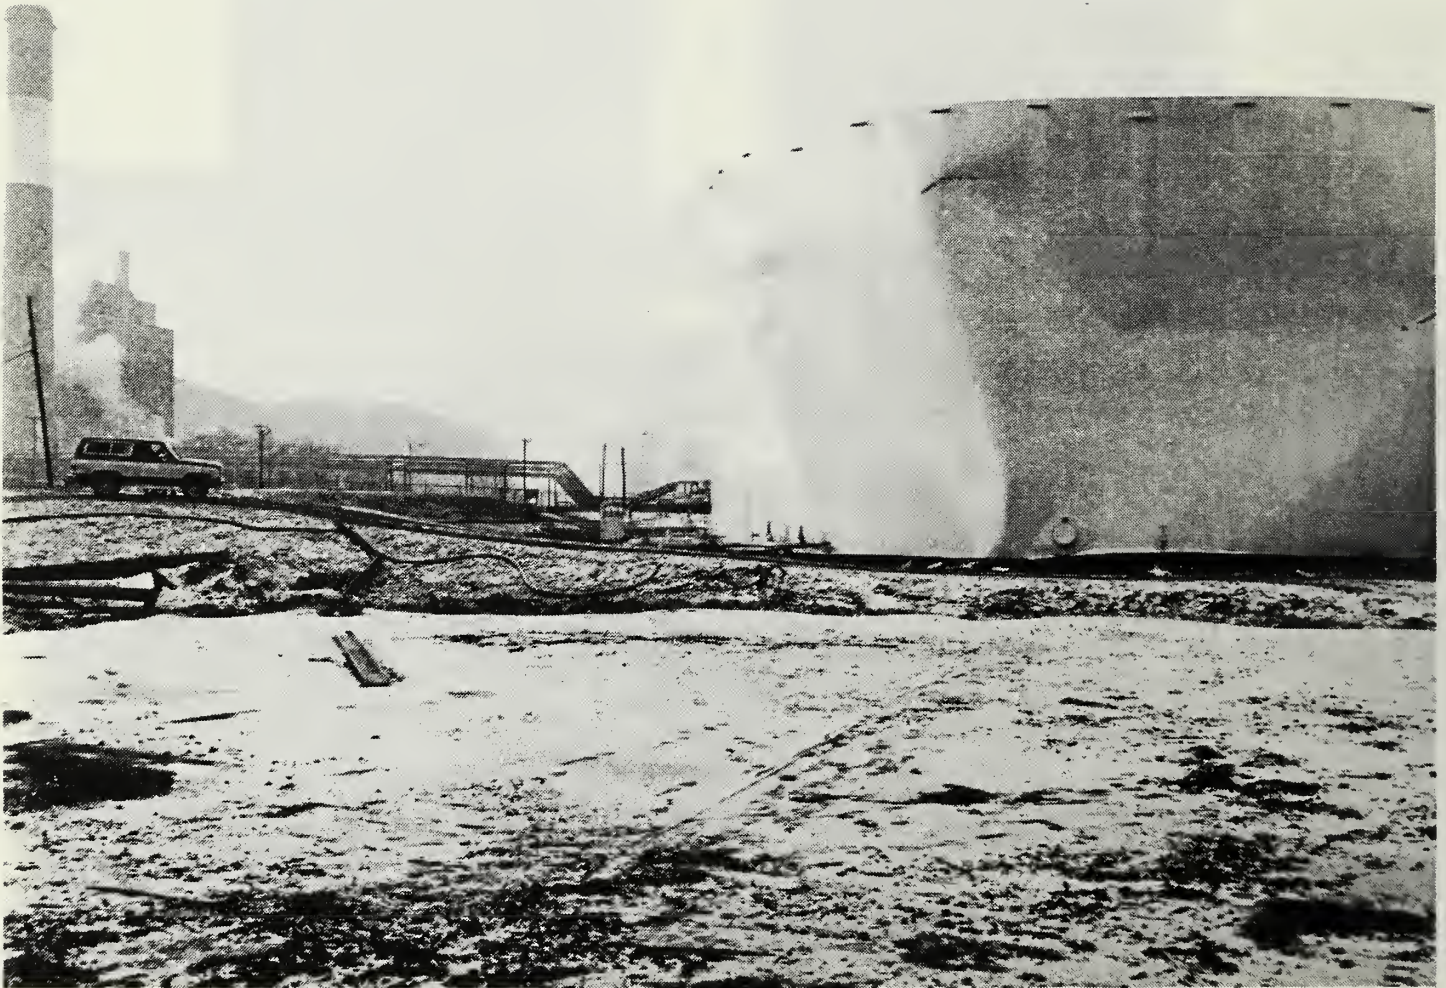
Tank No. 1367 Dented in the Collapse of Tank No. 1338
